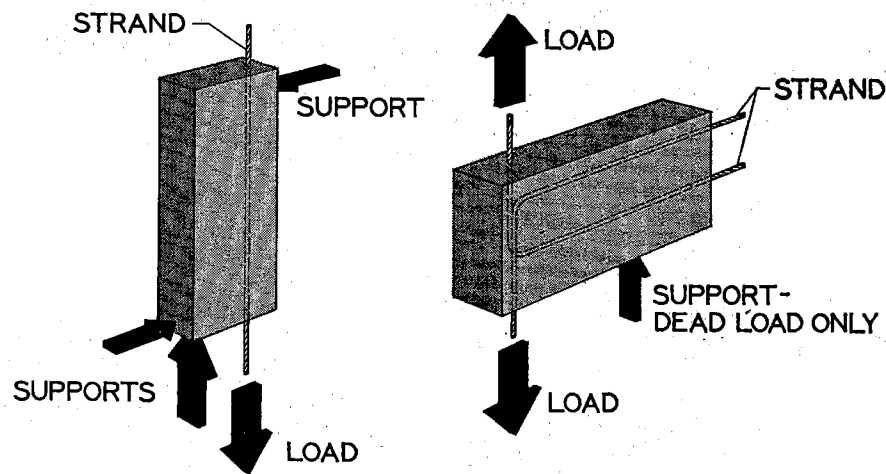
Specimen configuration: (left) straight strand; (right) bent strand.
